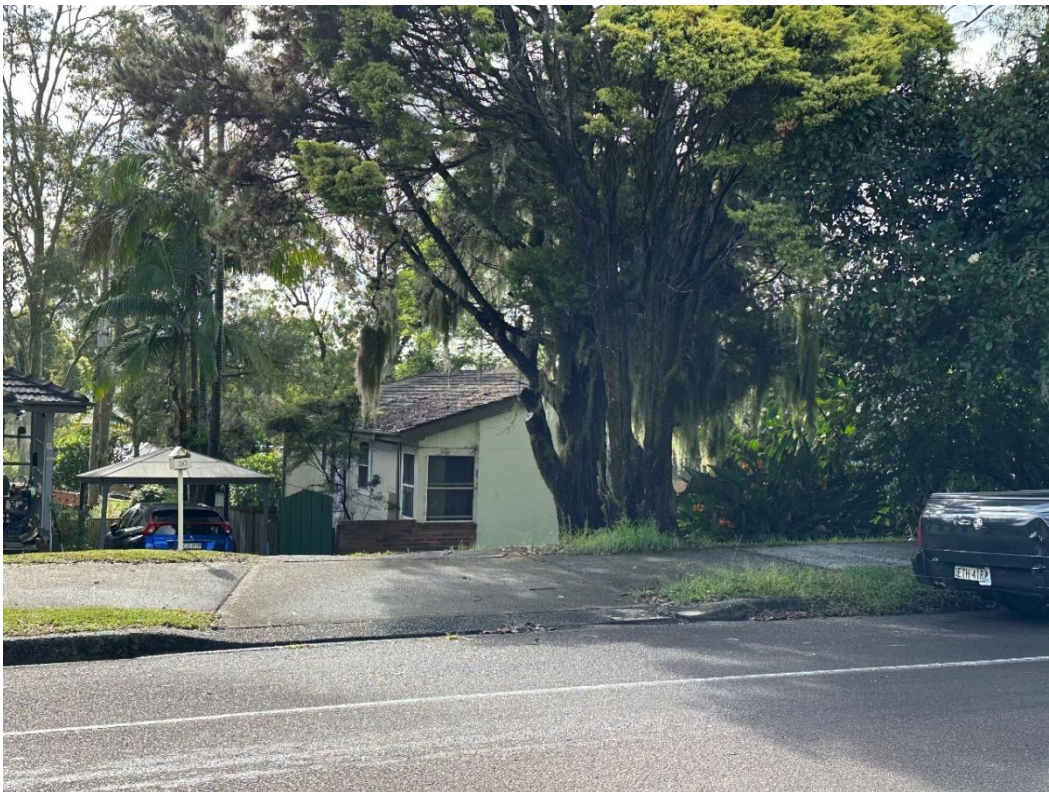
Development Site - 28 Cutler Drive, Source: BRS
